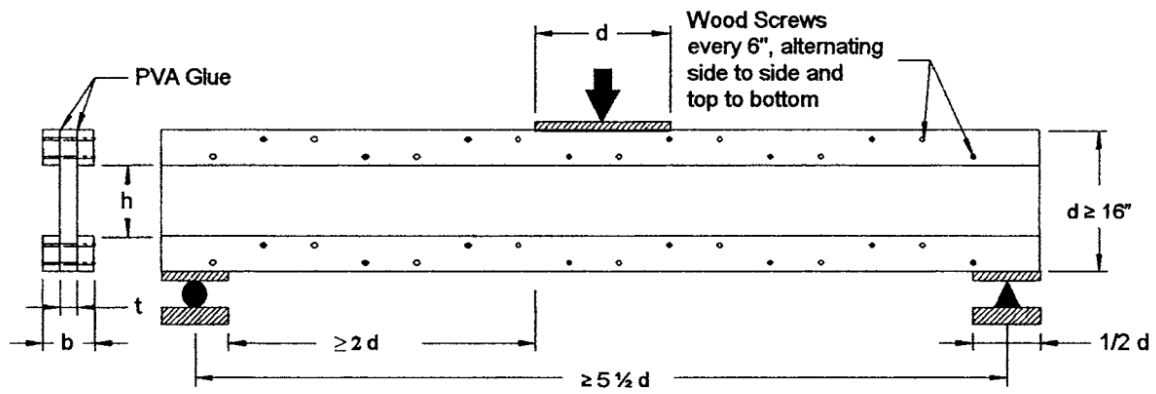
Example PSL Structural-Size Horizontal Shear Test Set-Up
